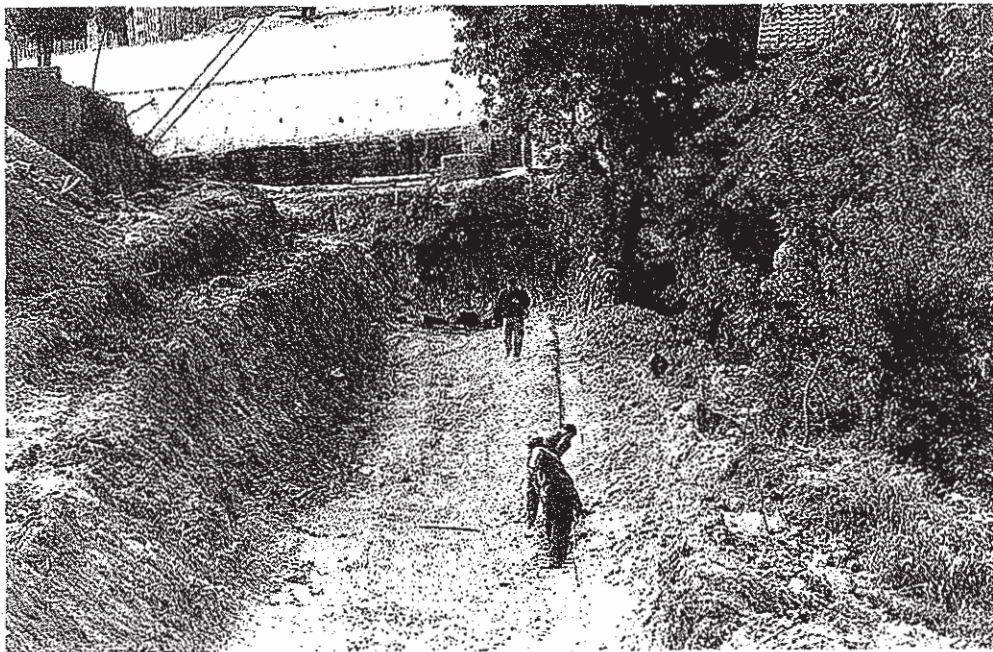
View of the foundation for the Nurbaba Geosynthetic Reinforced Segmental Retaining Structure
